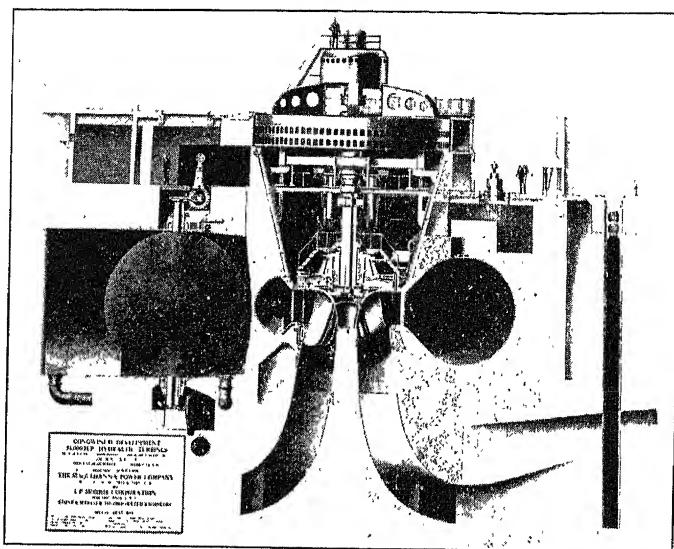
SECTION THROUGH WATER WHEEL UNIT
